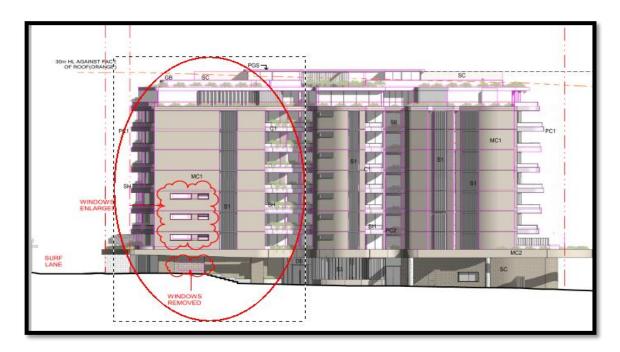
Southern elevation of 49 Gerrale Street showing south western of building designed devensive
